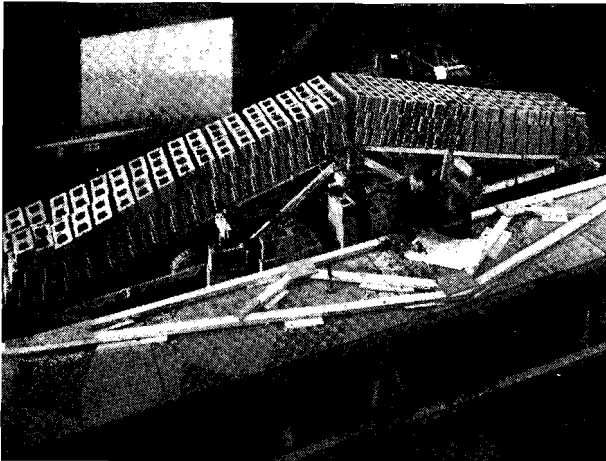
Load test on a prefabricated timber roof truss for use in house construction being carried out at the Building Research Centre of the National Research Council in Ottawa, Canada.
